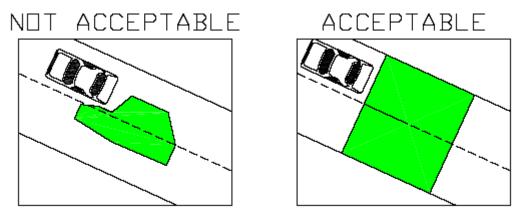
Example 1: Do not construct patches with angled sides and irregular shapes.
